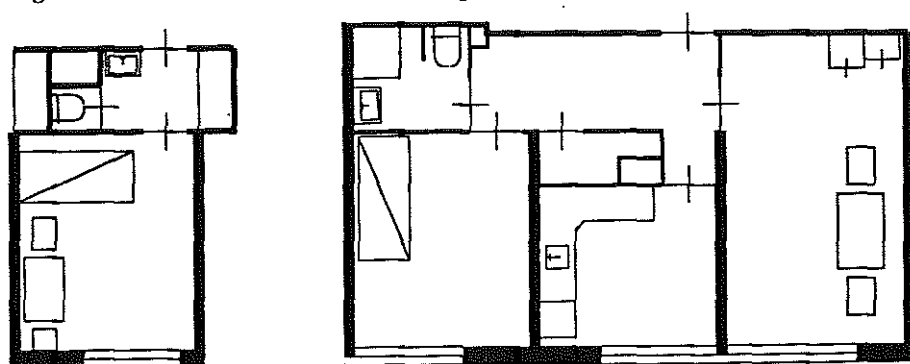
Jan Meertens, ground floor (below) + first floor (above) after renovation
